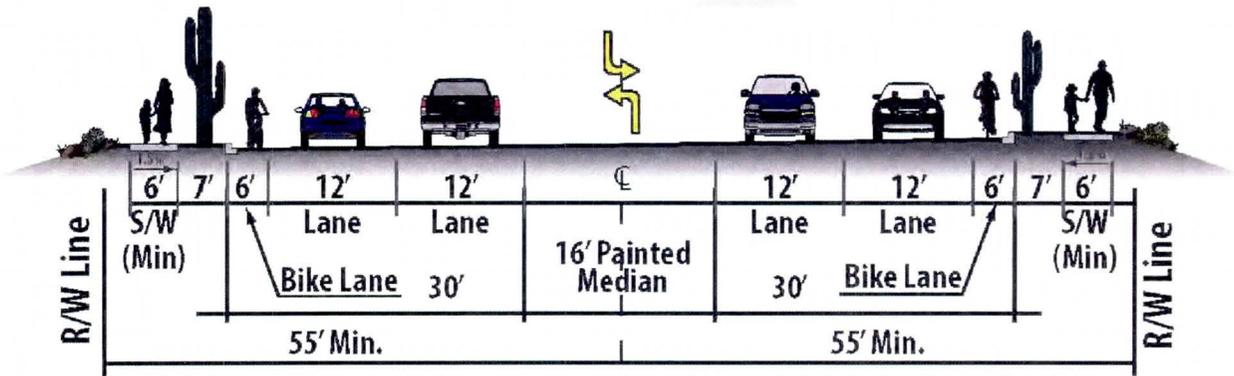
Ultimate Roadway Cross Section – Lost Dutchman Boulevard to Southern Avenue
